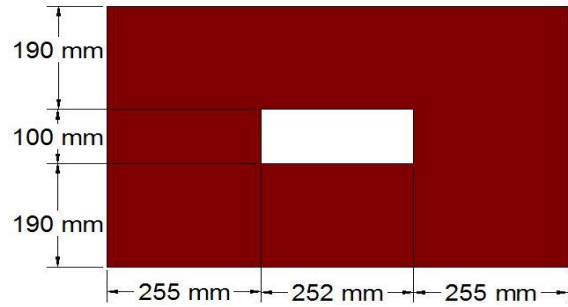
(b) Masonry wall with opening at the center of size 252×100
